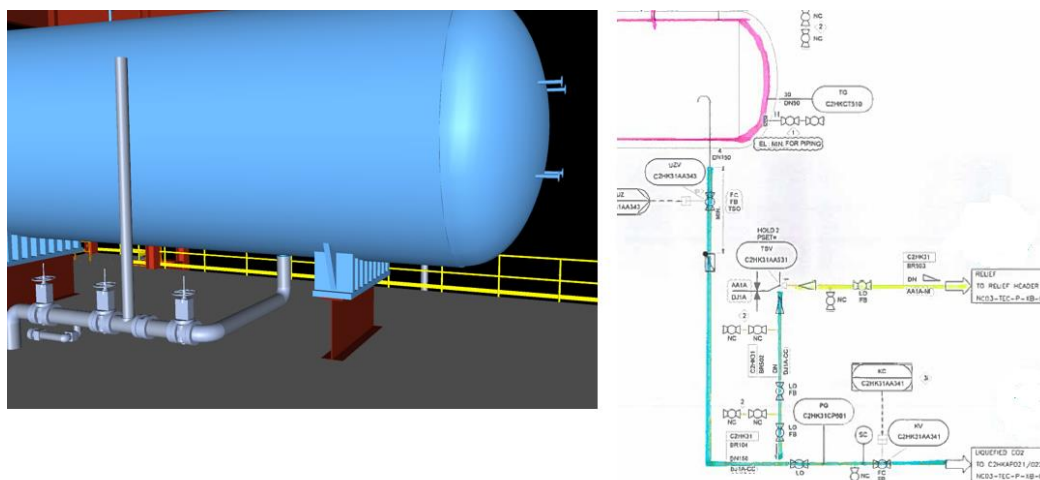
Piping and valves downstream the CO₂ storage tank (arrangement is equal upstream the storage tank)
